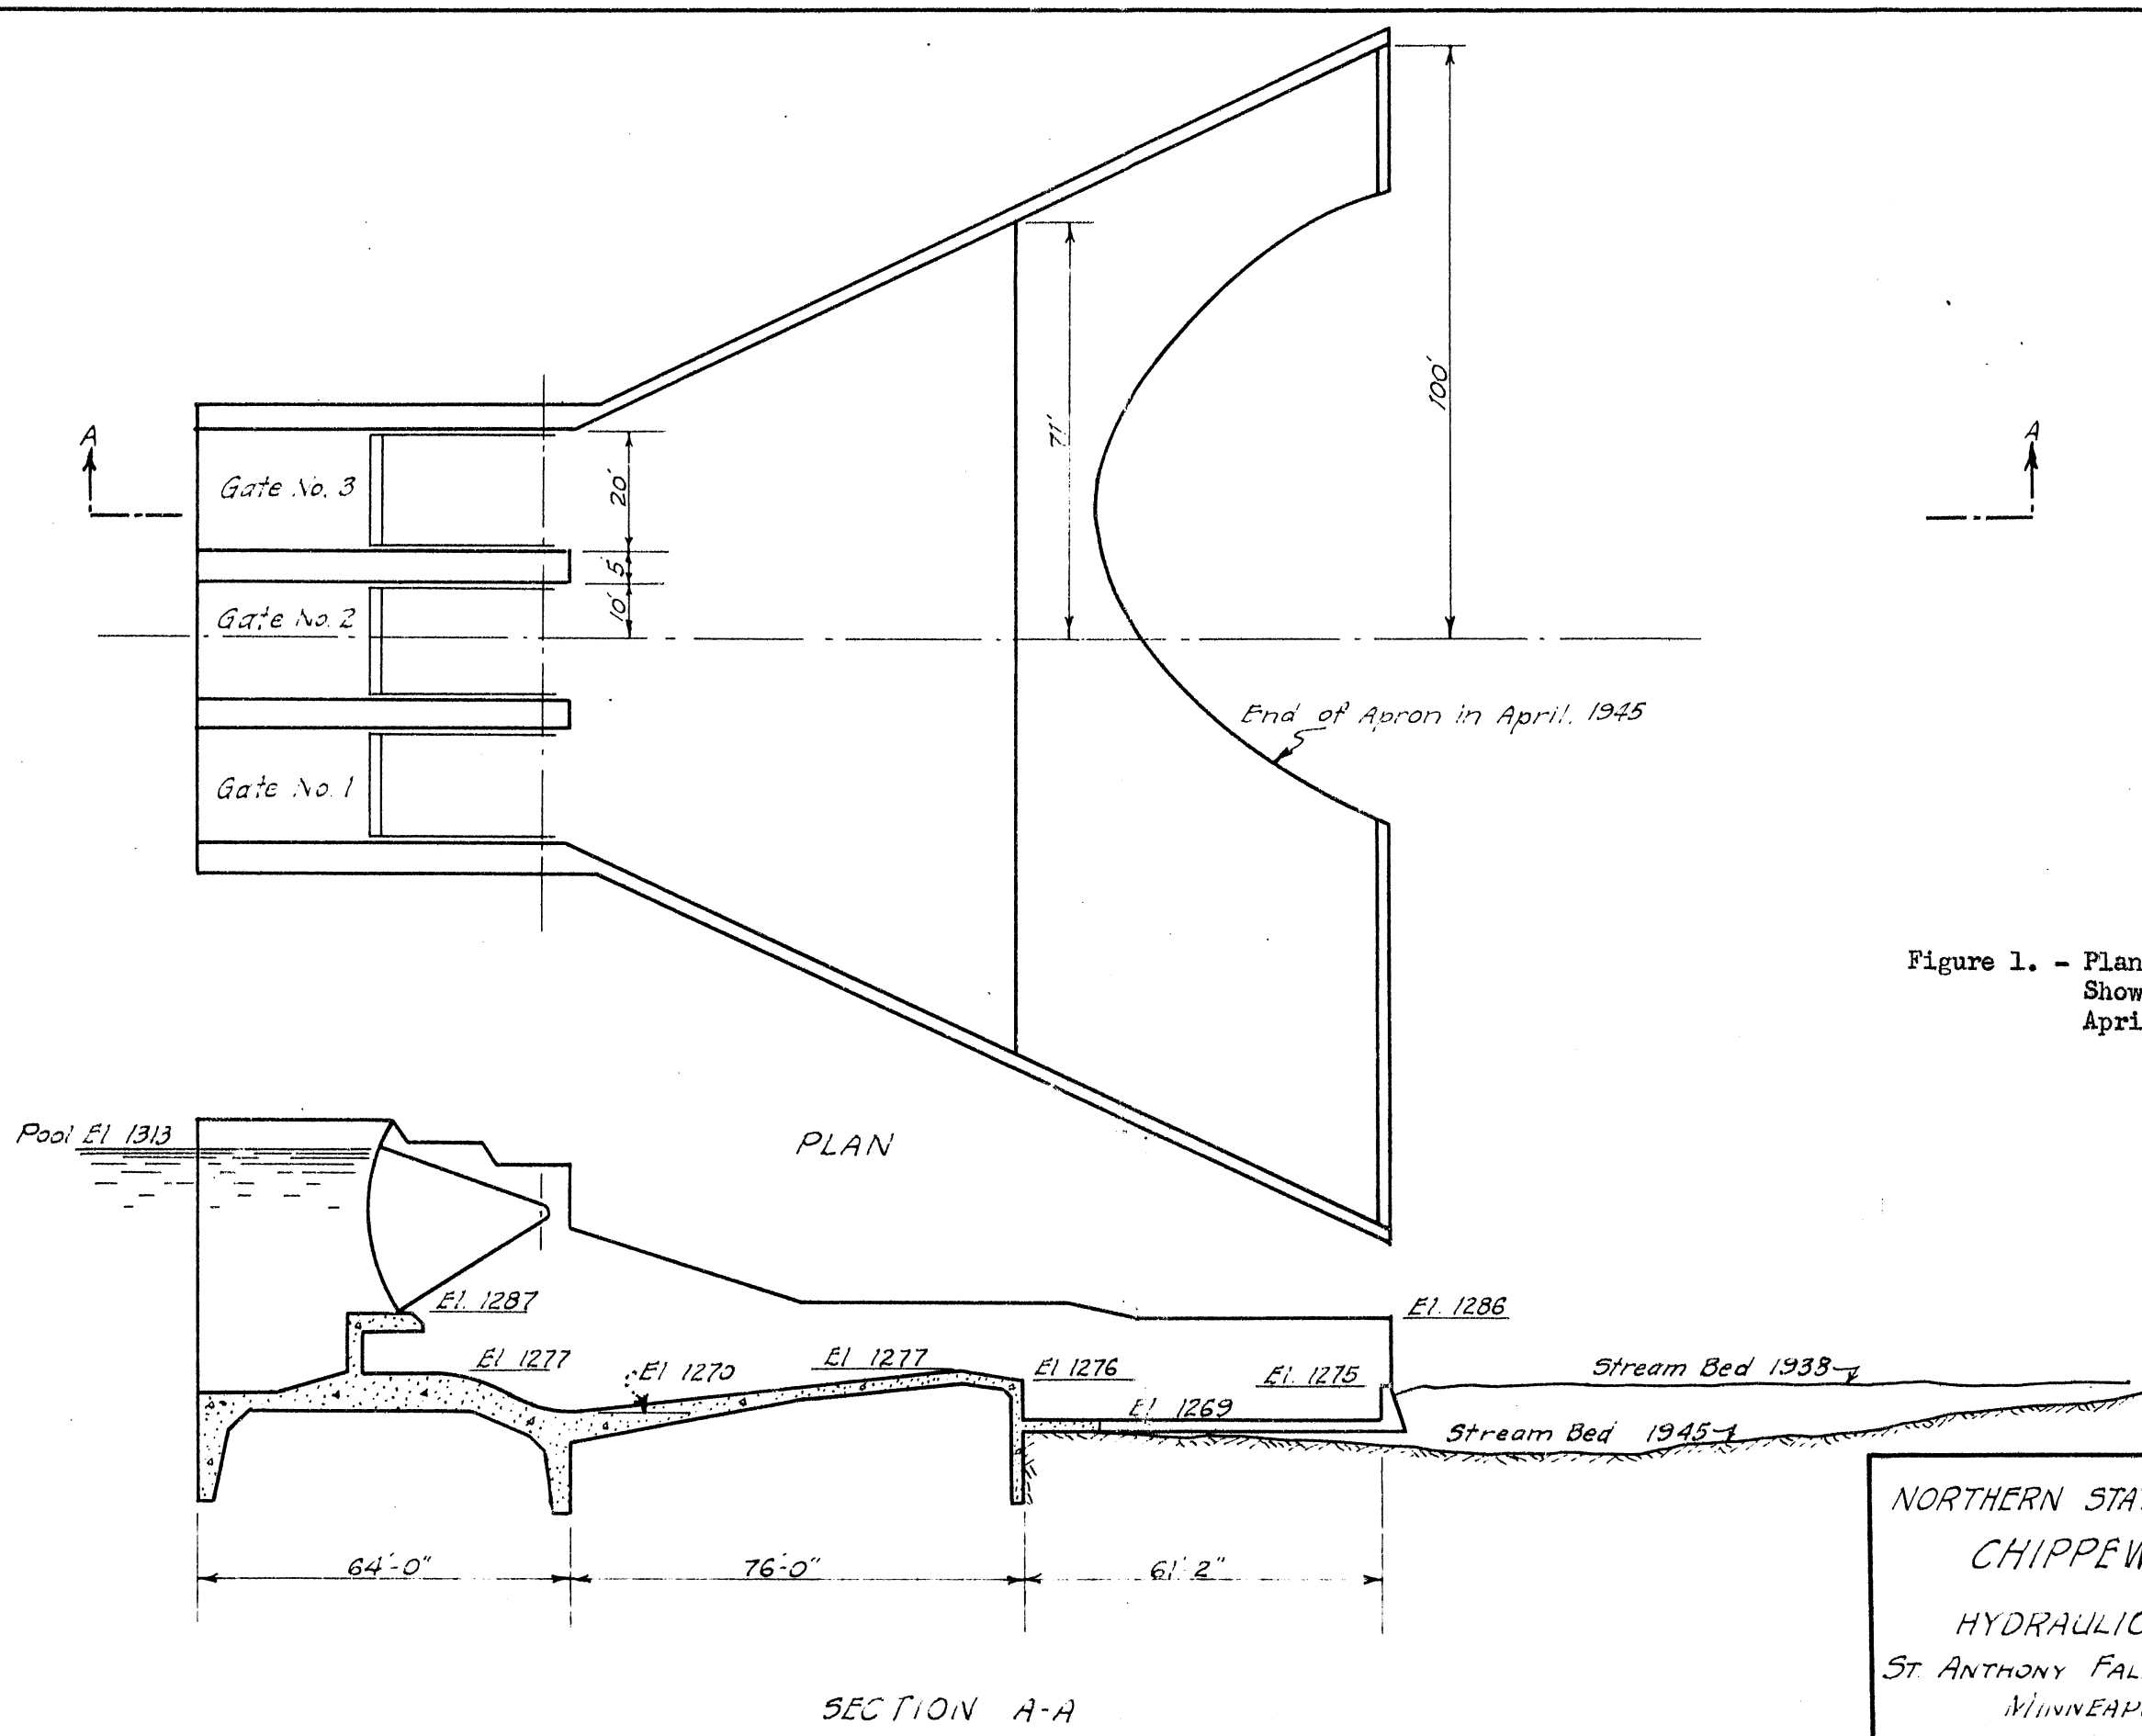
Plan and Section of Spillway Showing Condition of Apron in April, 1945.
